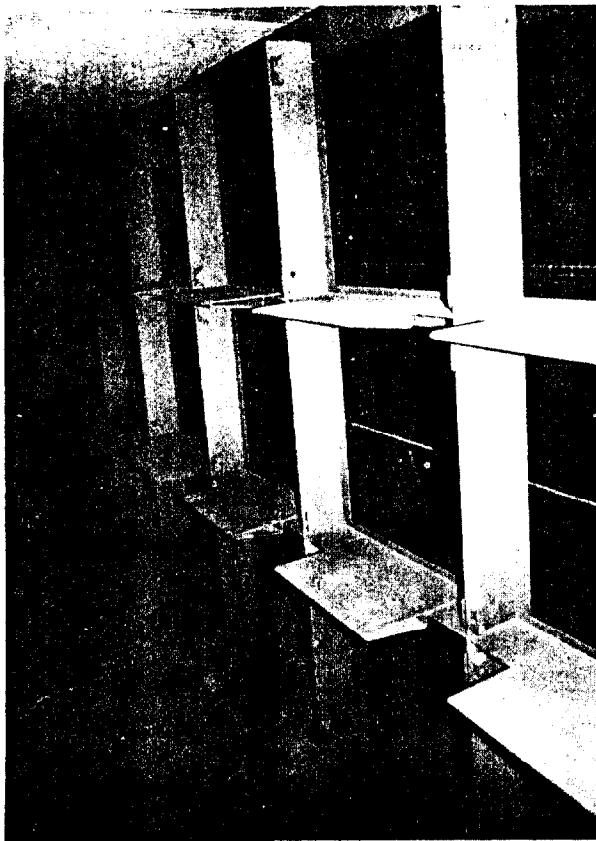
All-welded HEPA filter frame made from die-formed sheet-metal members. Note pocket-type configuration and filter rests beneath openings. Filters are arranged in two 6-wide by 3-high arrays, one above the other with a permanent work gallery between.
